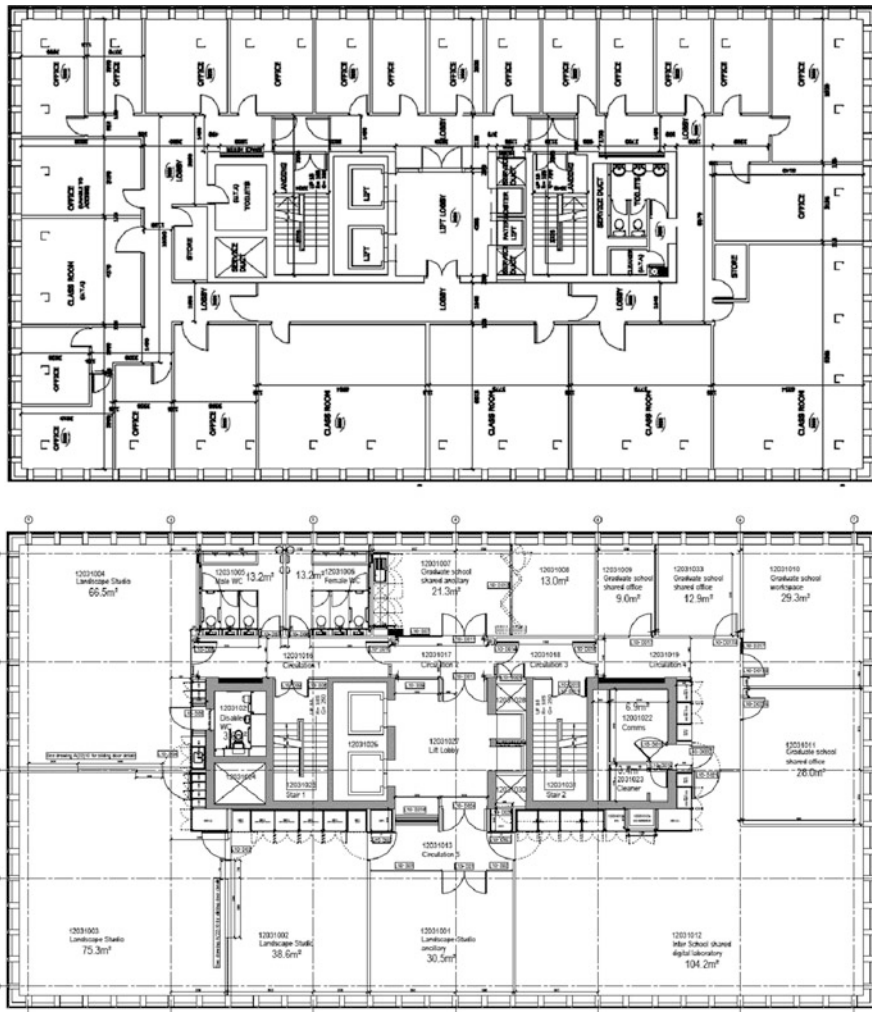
10th floor plan showing two cores and partitioned office spaces before and after retrofit
